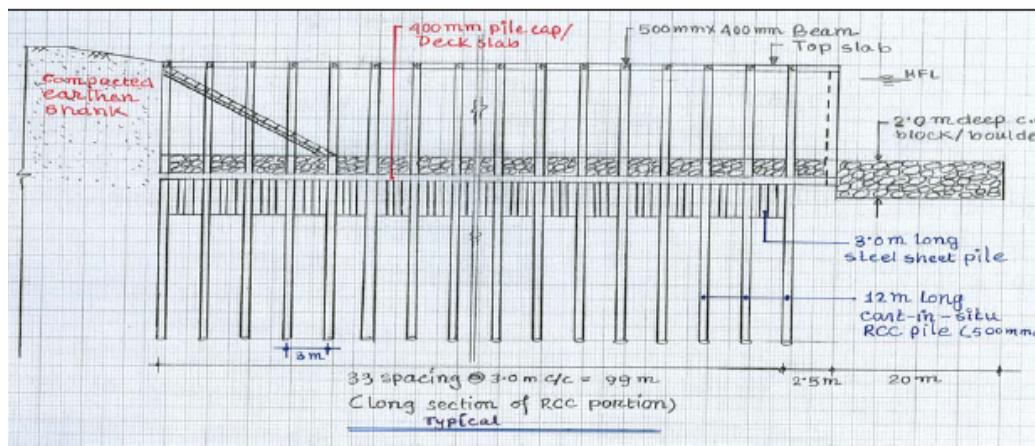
Typical long section of the RCC groyne (Source: Uddin 2007)
